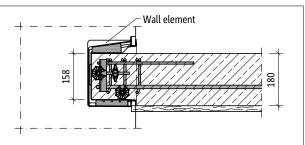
Schöck Tronsole® type Z: Wall element as stay-in-place formwork; underside of the landing flush with the connection frame of the wall element
